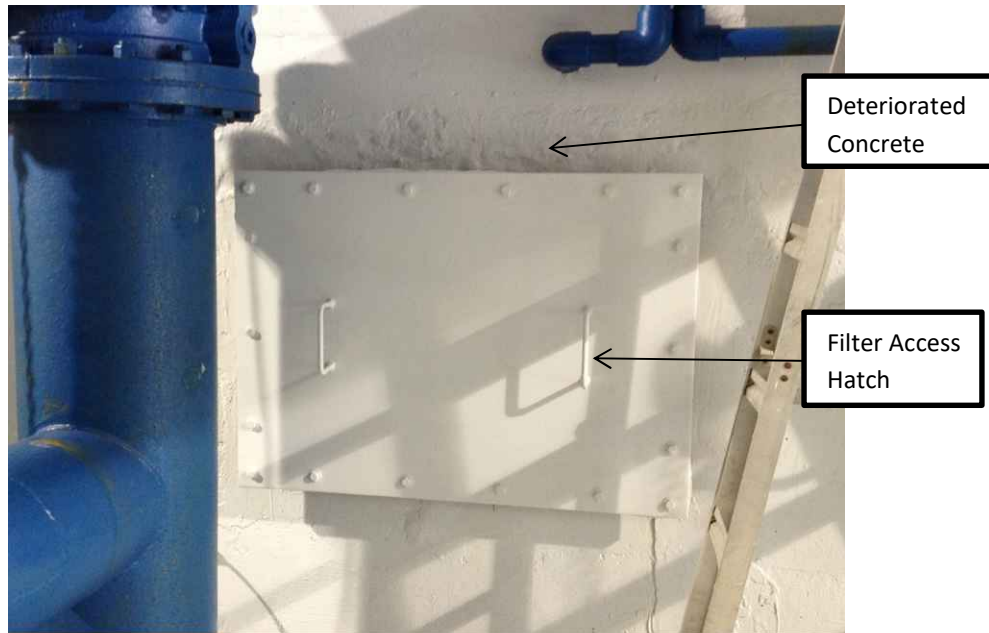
Filter Hatch in Concrete Filter Wall
